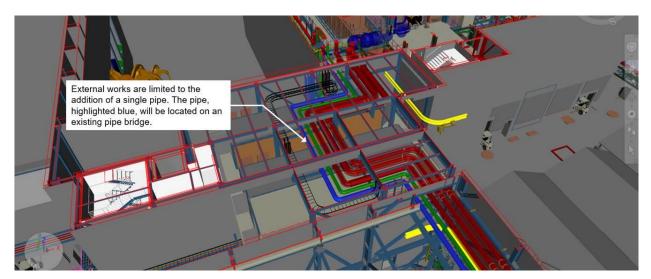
3D Model Close-up Aerial View of Consented Development with external pipework and pipe supports (Note – Proposed Project external pipework is coloured blue)
